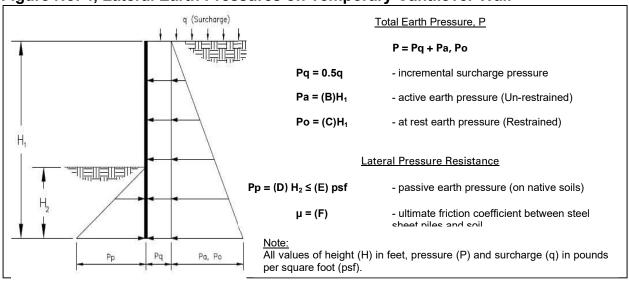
, Lateral Earth Pressures on Temporary Cantilever Wall
